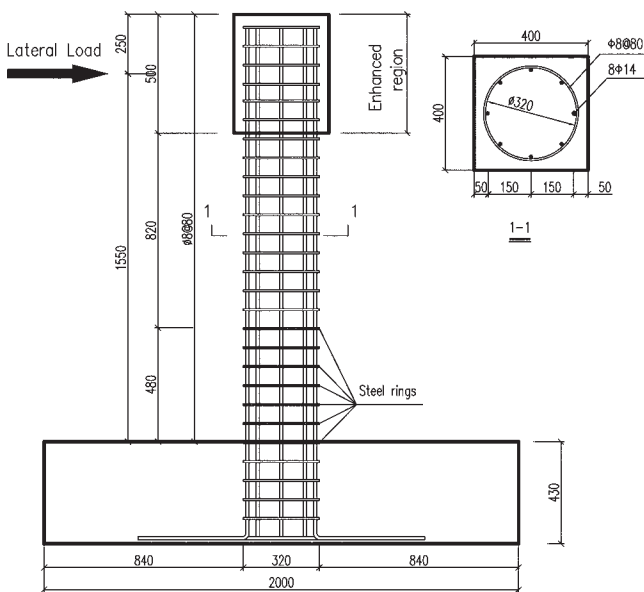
Specimen details. (Note: Dimensions in mm; 1 mm = 0.0394 in.)
